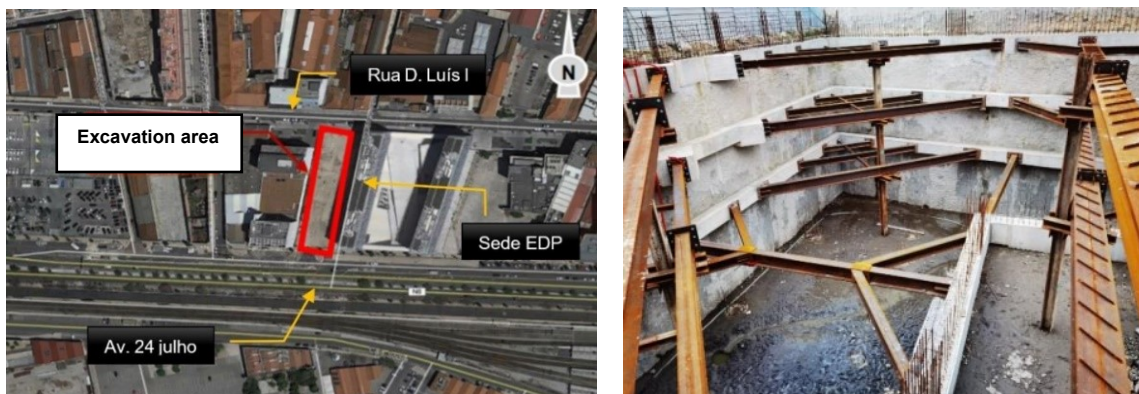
Plan view of the construction site area and neighborhood conditions (left); Struts and diaphragm walls (right)
